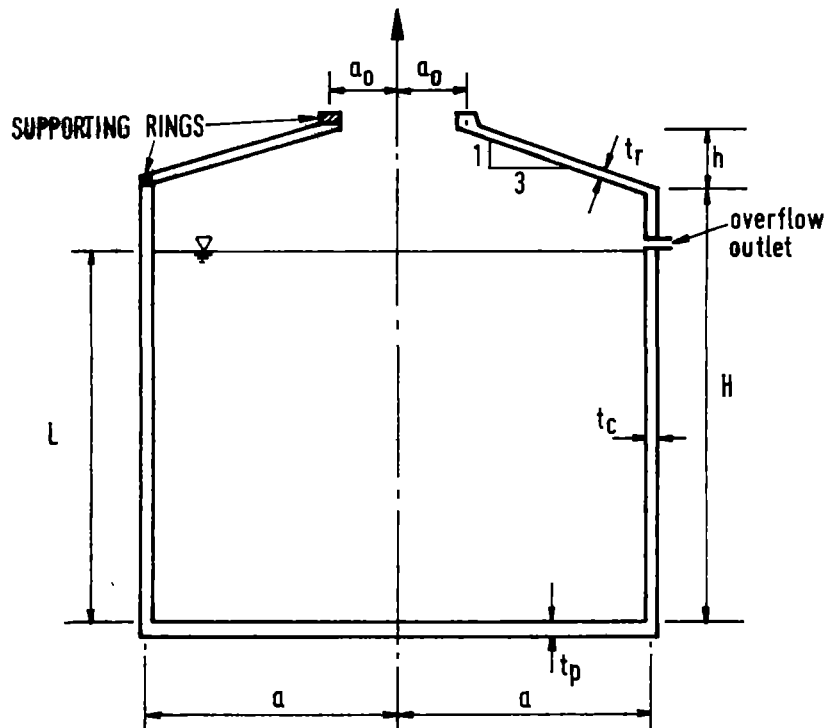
Cylindrical Tank with Truncated Conical Roof
